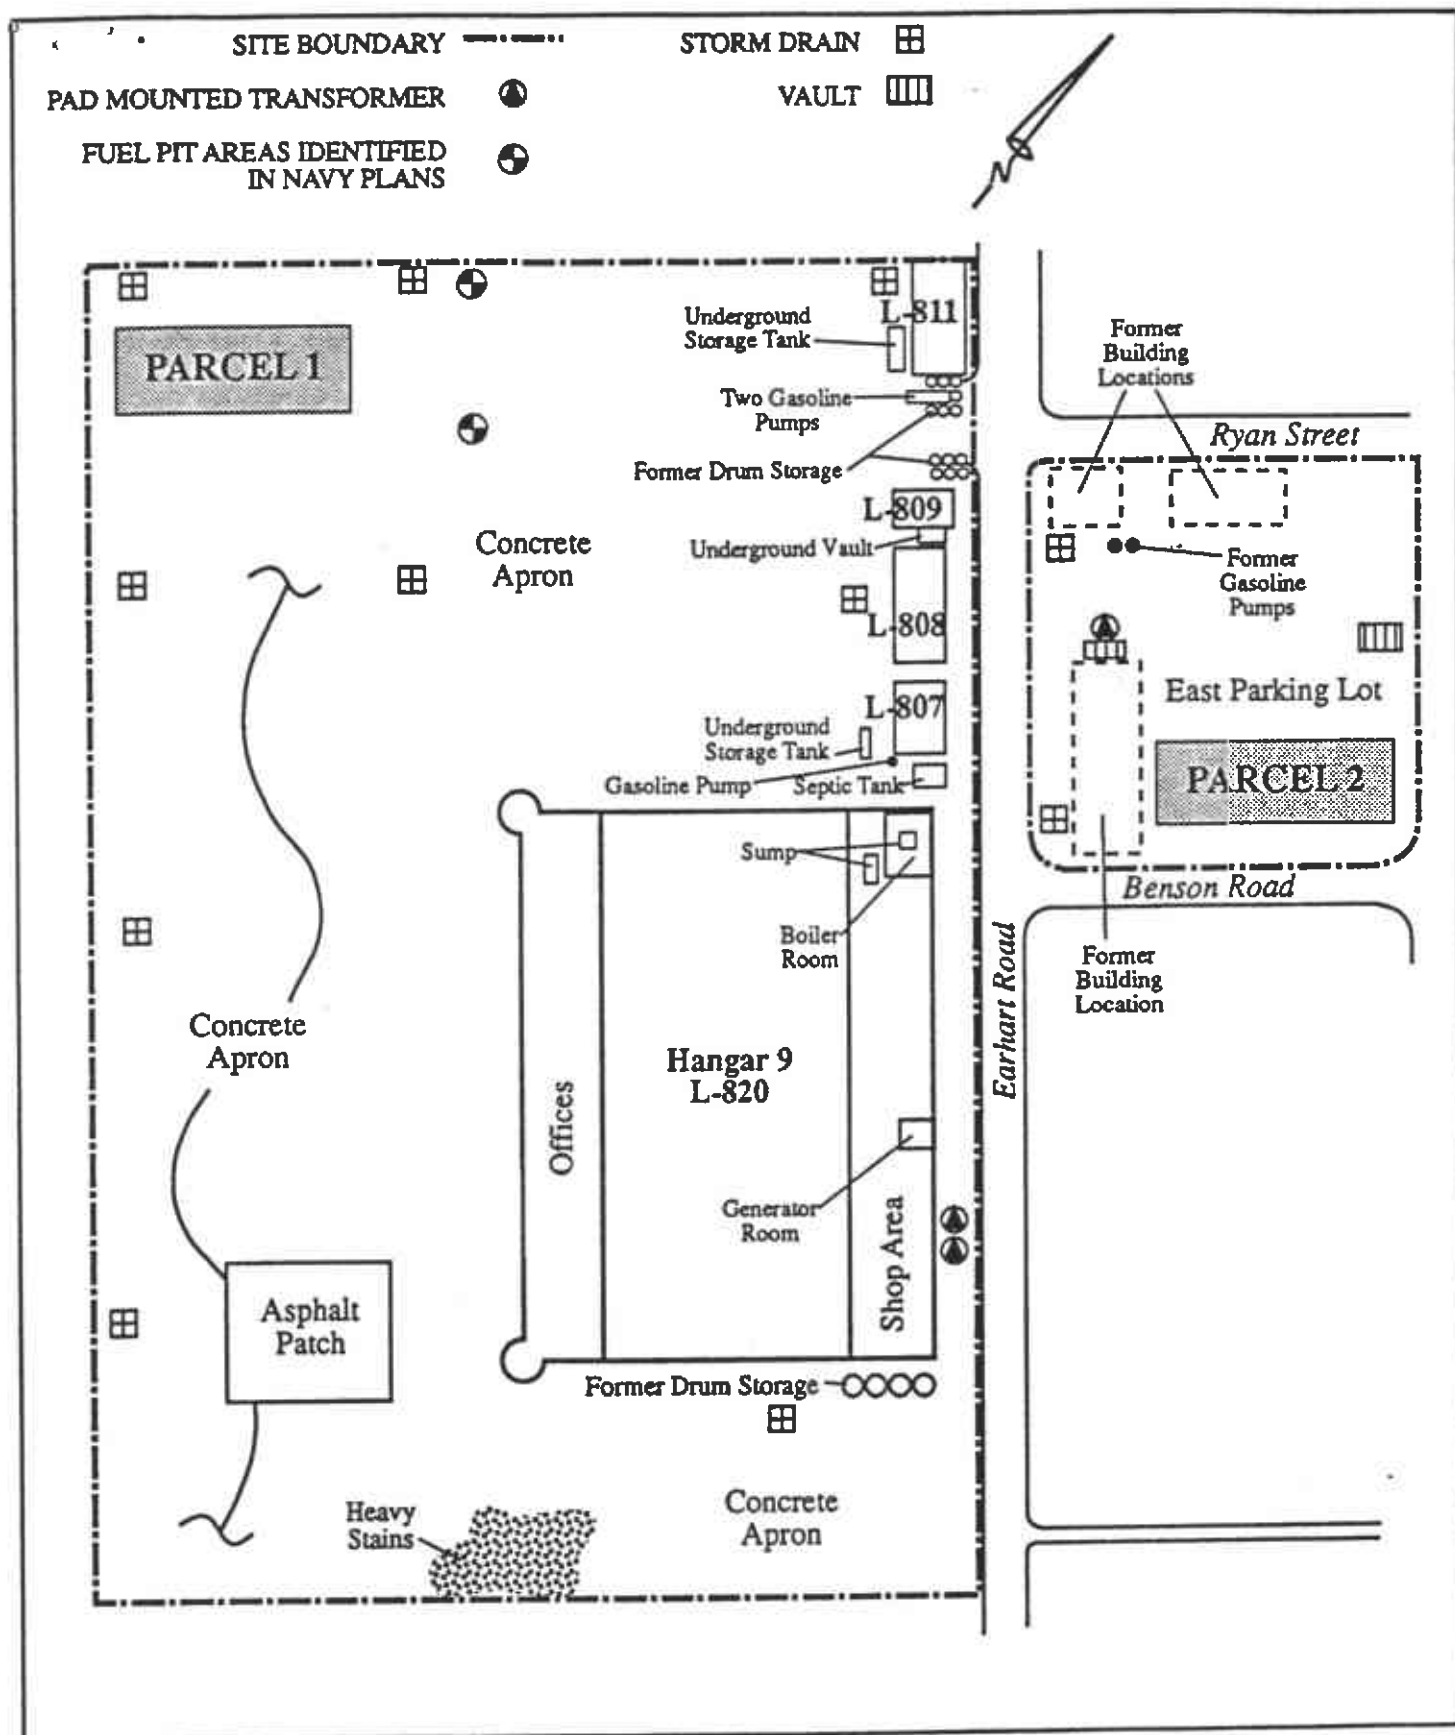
Hangar 9 Site Plan (Parcels 1 and 2)
